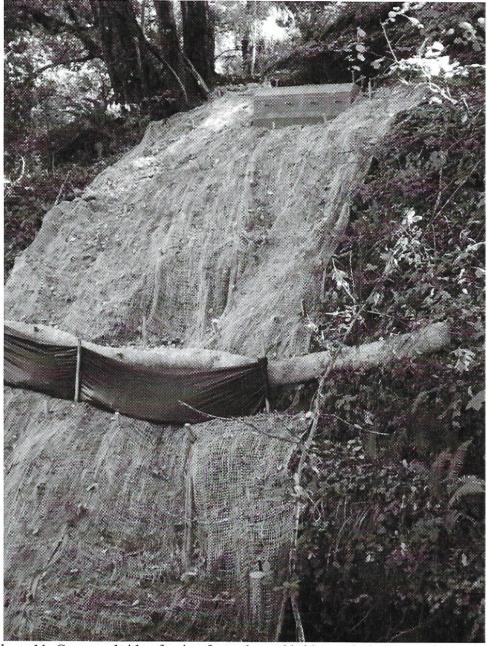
Concrete bridge footing for a planned bridge at drainage A. The County required erosion control measures implemented on the steep drainage banks.
